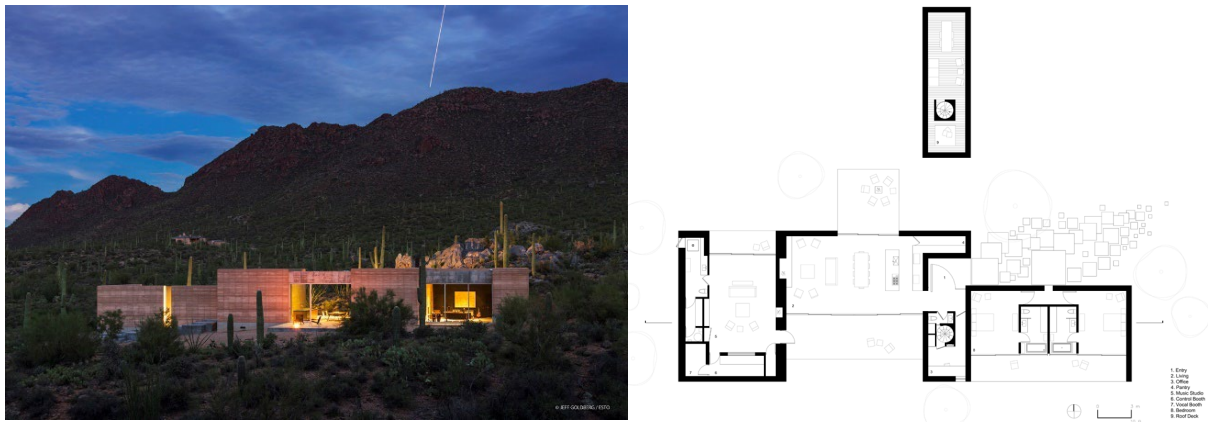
a) Photograph of the Tucson Mountain Retreat and b) Floorplan of the first floor and the terrace of the Tucson Mountain Retreat (DUST Architects, 2012)
